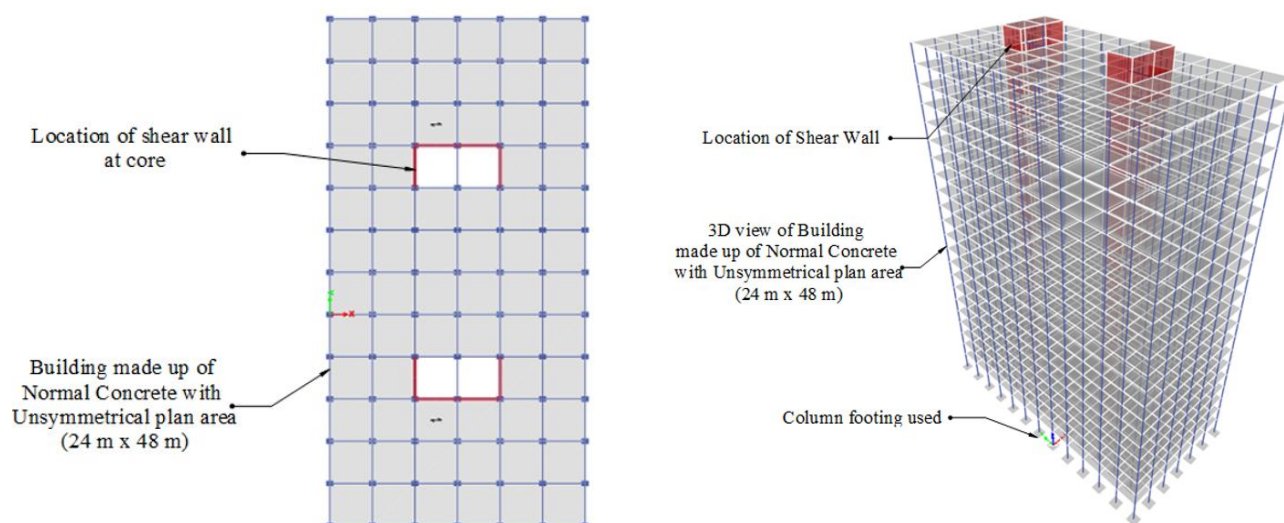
Plan and 3D view of unsymmetrical plan using Normal Concrete (NC2)
